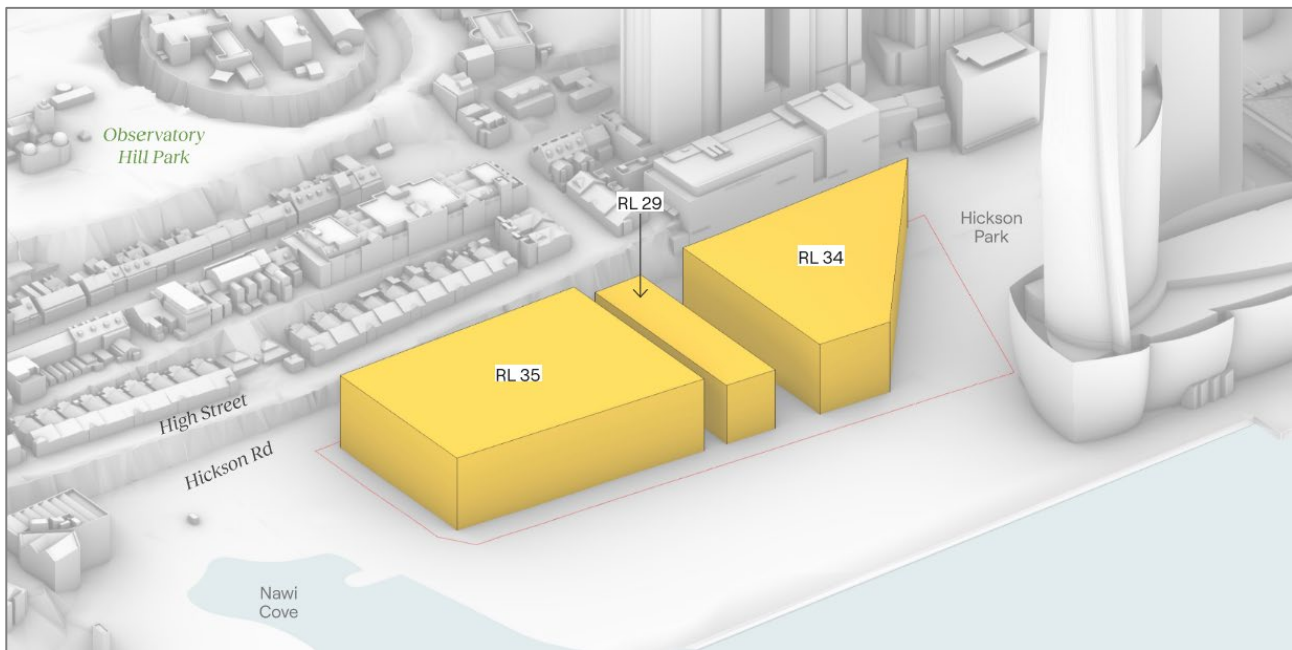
APPROVED CONCEPT PLAN IN 3D (SJB)
